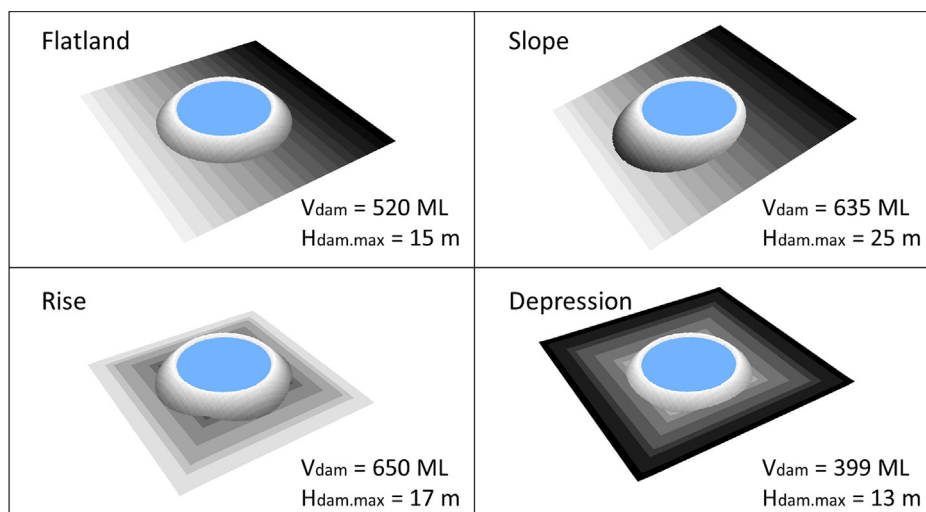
Excavation for dam construction (V_{dam}) and maximum dam wall height ($H_{dam,max}$) under 4 typical terrains to store 1 GL of water (elevation exaggeration: 3).
